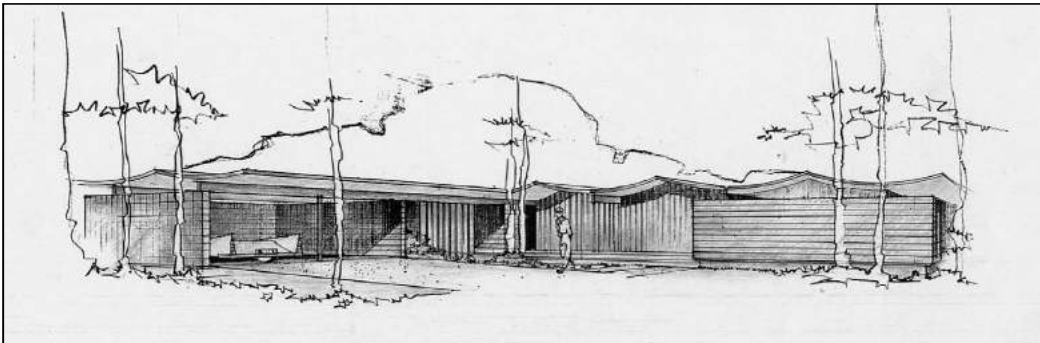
Brill House [Charles Reed, Jr. collection, c. 1959]
